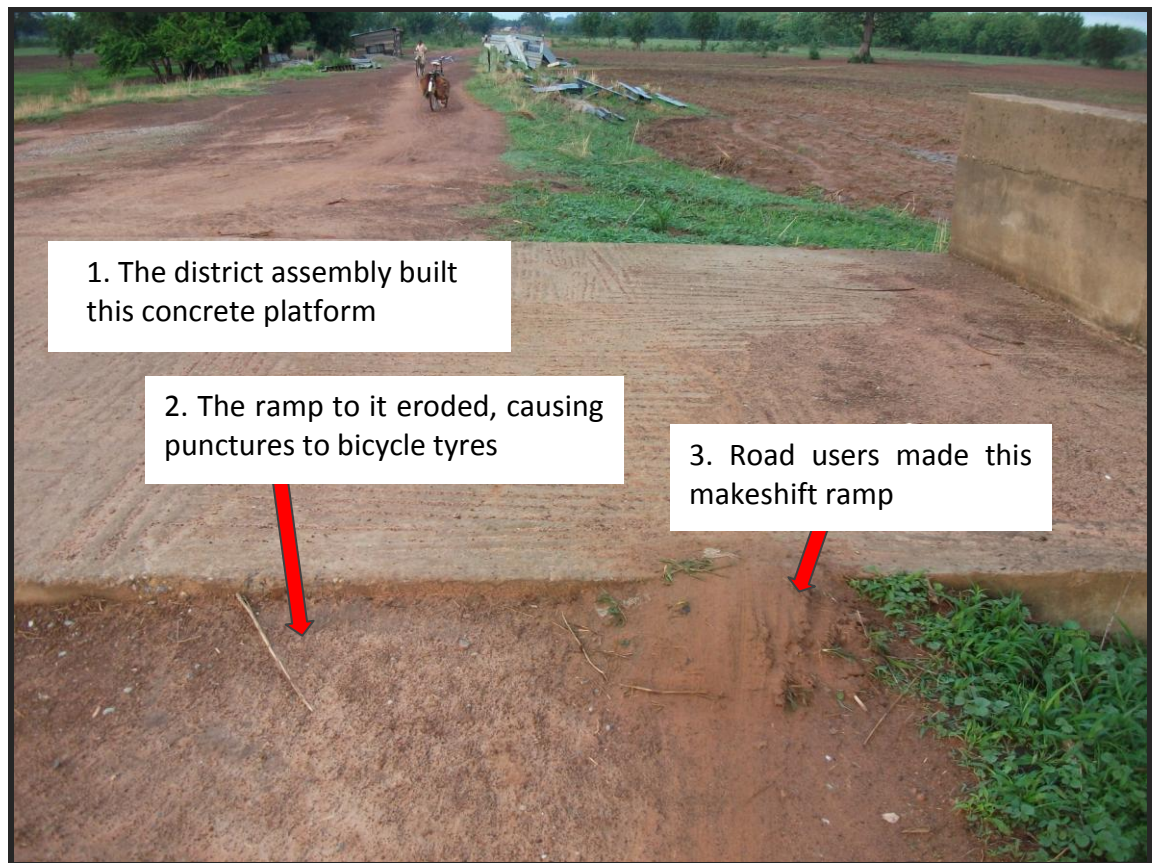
An improvement made to the road leading from Ypilgu to Kumbungu.
